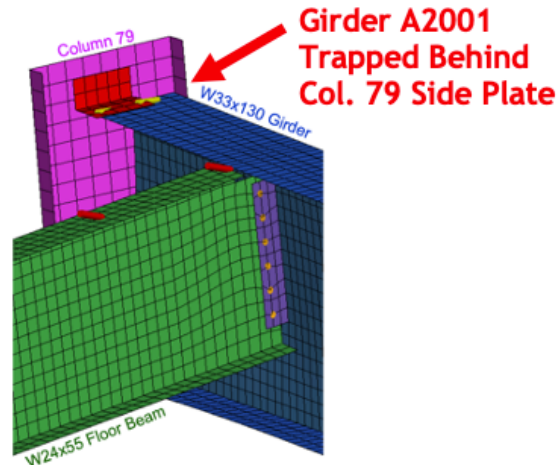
Lateral displacement of girder due to thermal expansion of floor beam.
